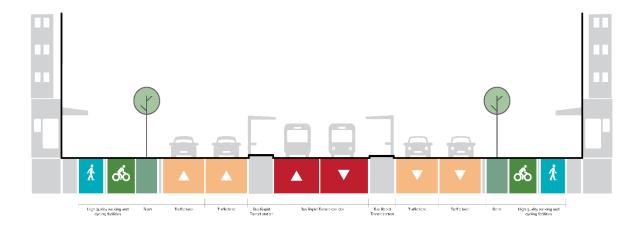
NoR 1 and NoR 2 Typical Cross Section
